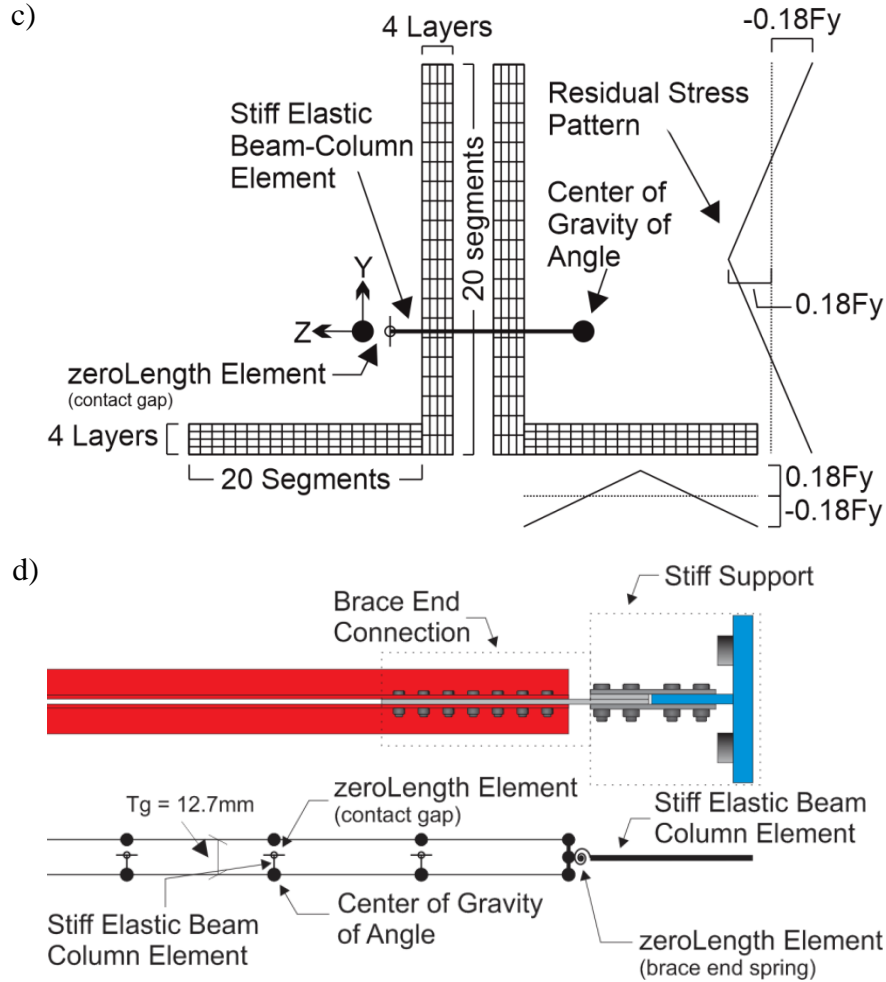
Built-up double angle brace model: a) Brace configuration and overall model; b) Stitch connection at the brace mid-length; c) Brace cross-section with fibers and residual stress patterns; d) Contact elements and brace end connection modelling (continued)
